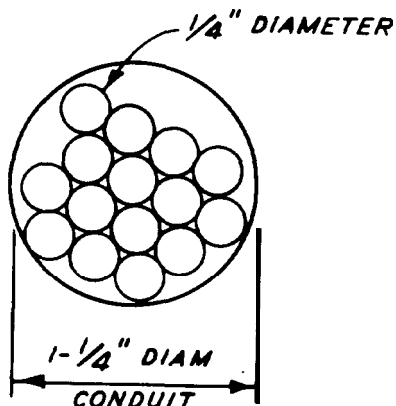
Method of Sizing Conduit to Hold Ten 1/4-in. Cables.
